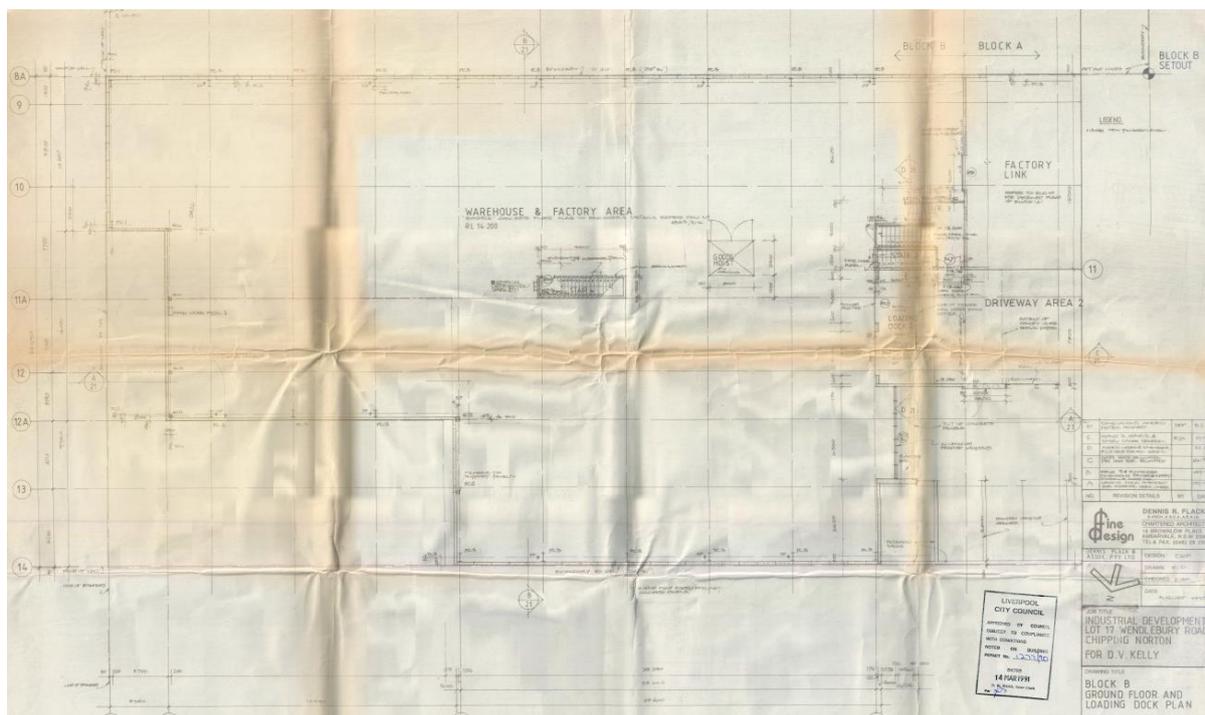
Extract of the approved block B ground floor and loading dock plan under no. 211/1990 (northern portion)
